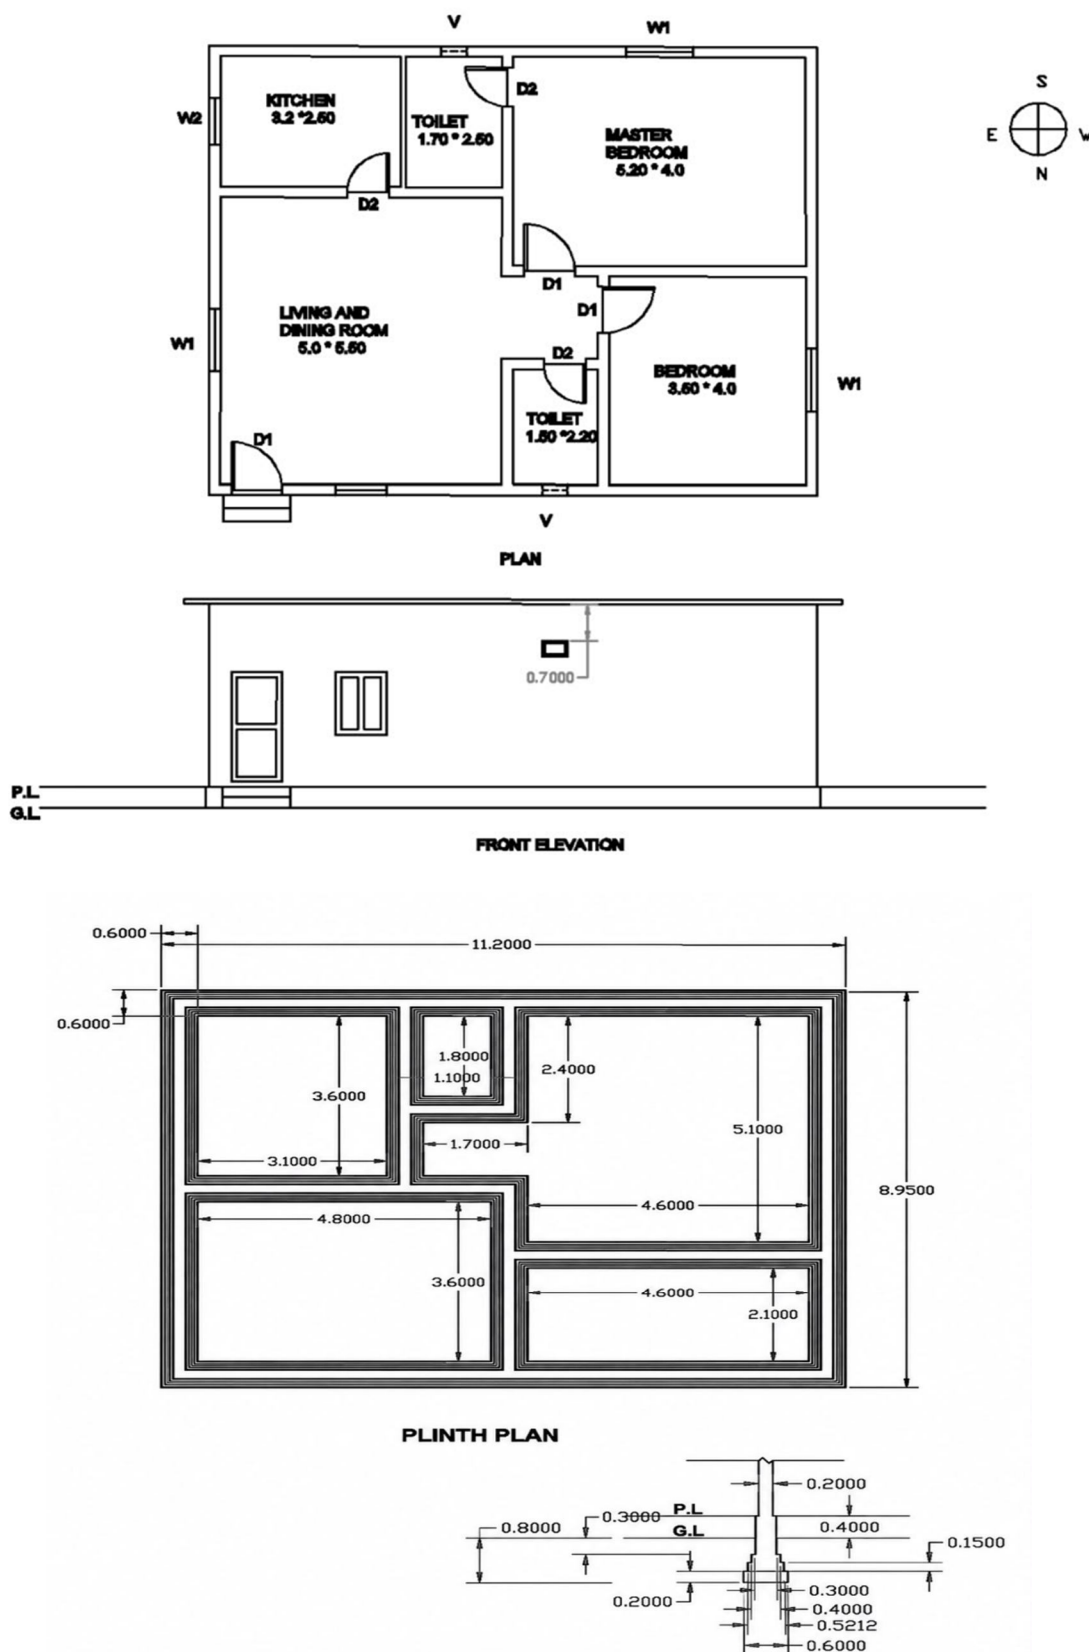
Plan, Elevation and plinth plan of low-cost housing
